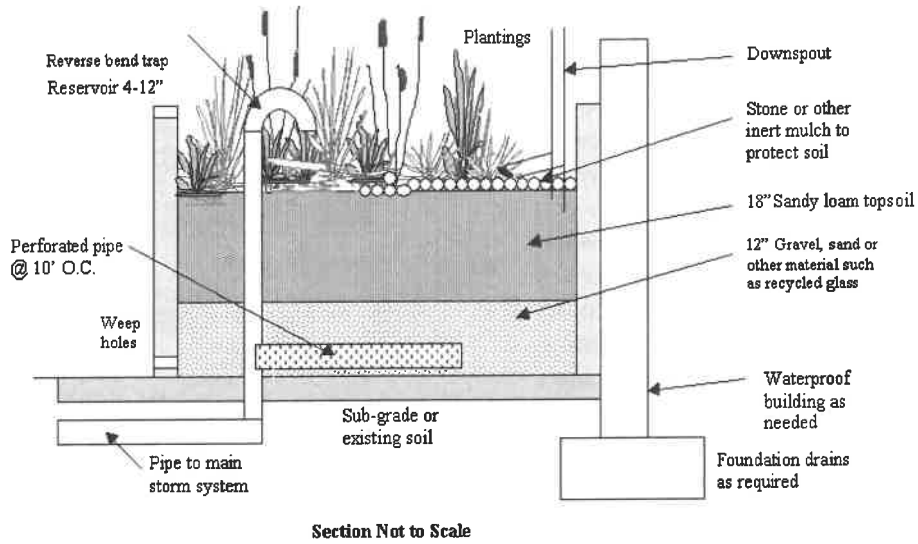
Stormwater Planter Box Biofiltration System.
